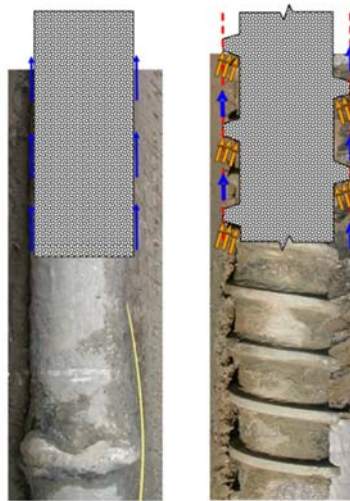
Smooth shaft and threaded shaft soil displacement piles schematic load transfer mechanism
